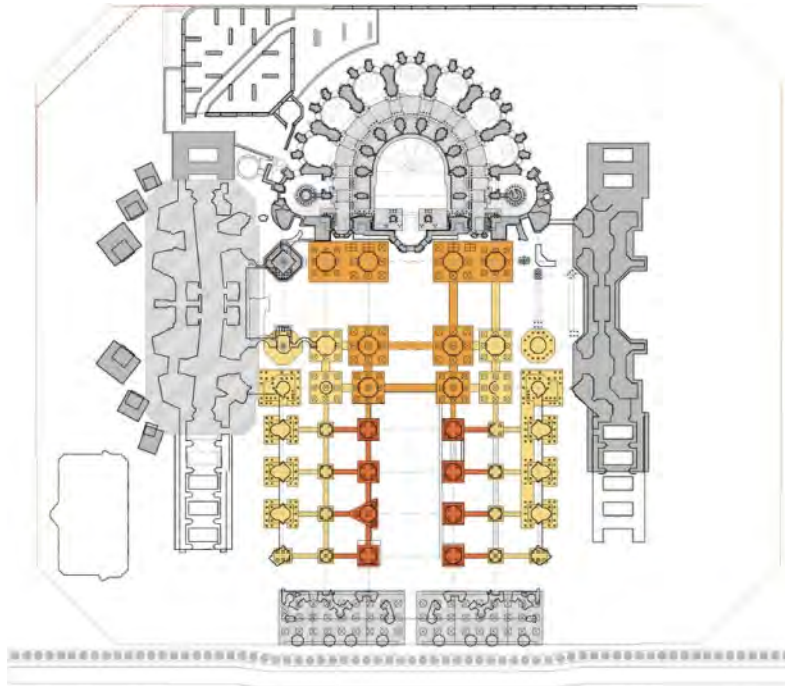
Plan view of Sagrada Familia foundations. Courtesy of Sagrada Familia Foundation.
